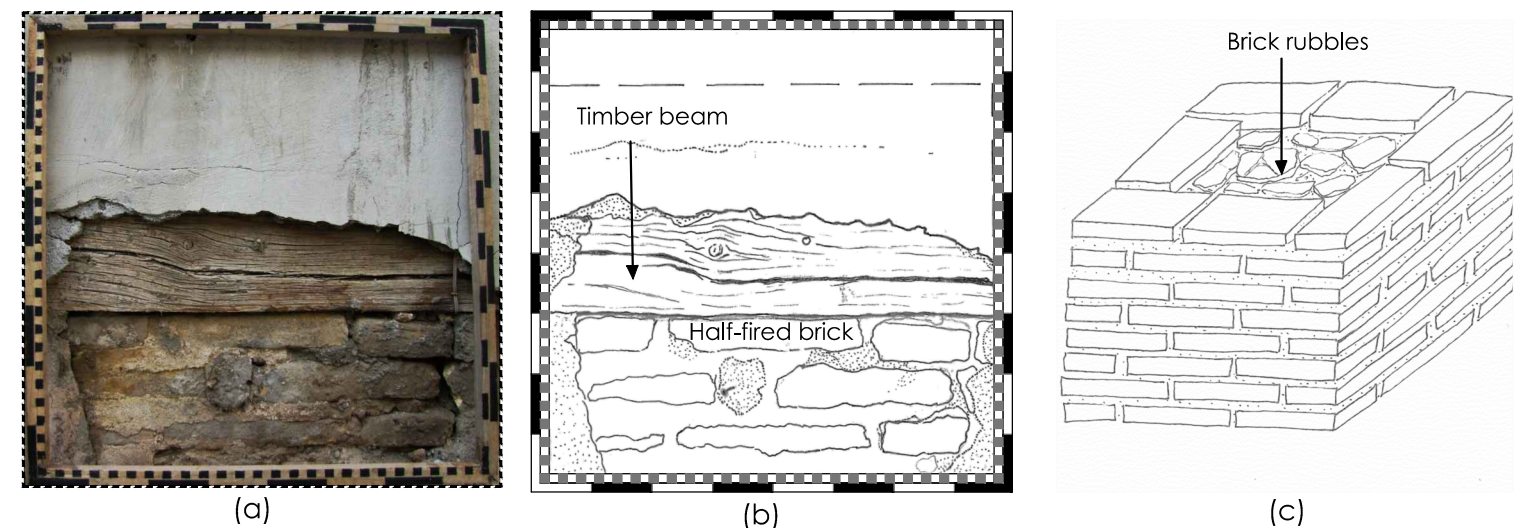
The burnt-brick masonry details on the ground floor; (a) removal of the cement layer, (b) use of half-fired kiln bricks (23 × 11.5 × 4.5 cm) along with wooden beams in order to create a durable masonry and an anti-seismic protection system, (c) use of brick rubbles with lime-mud mortar at the central part of the thick column.
